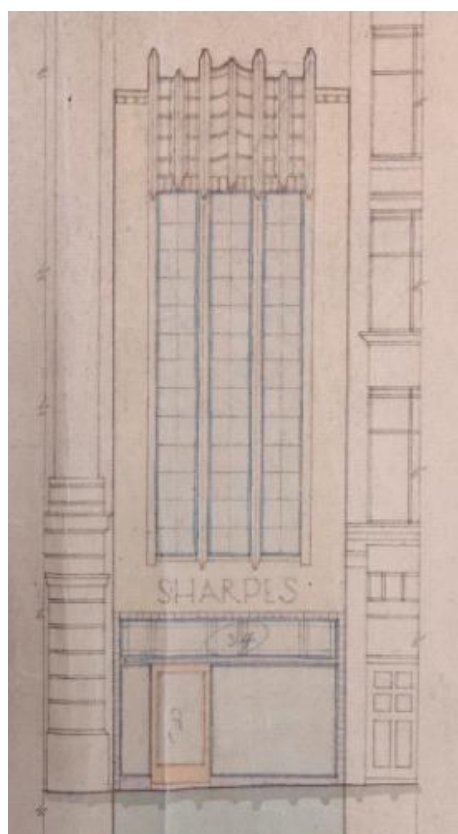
H W & F B Tompkins' drawing for the subject building at 188 Bourke Street, Melbourne, which was to be occupied by Sharpe Bros. (Source: PROV VPRS 11201/P1/382)
